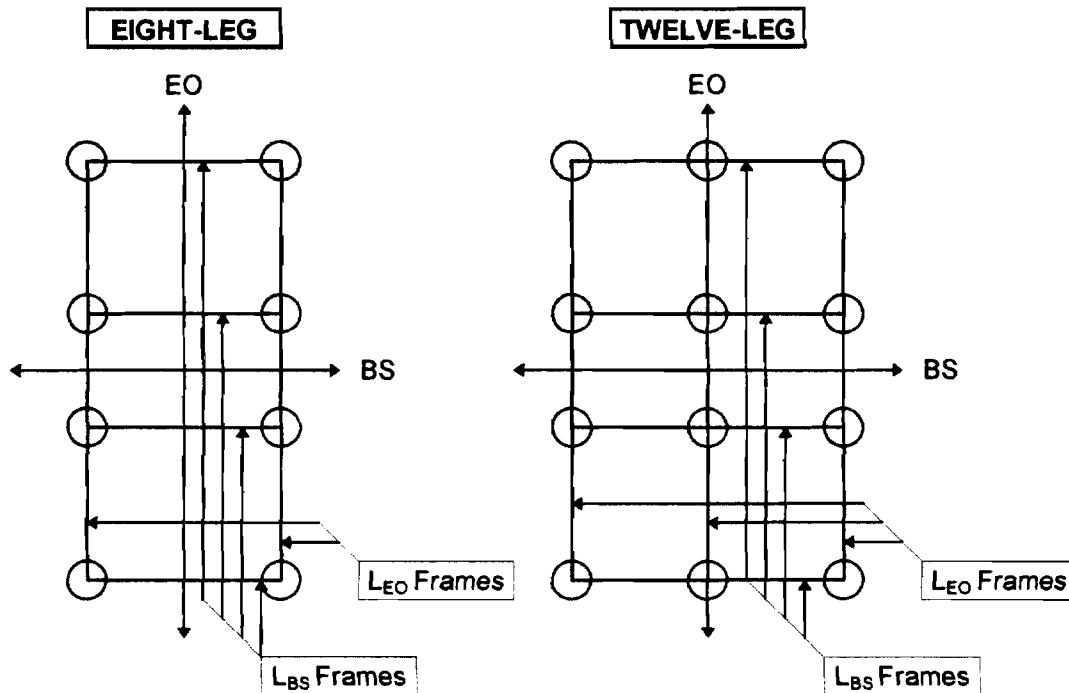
B: Plan View of Pile Layouts Assumed by TOPCAT for Standard Jackets
